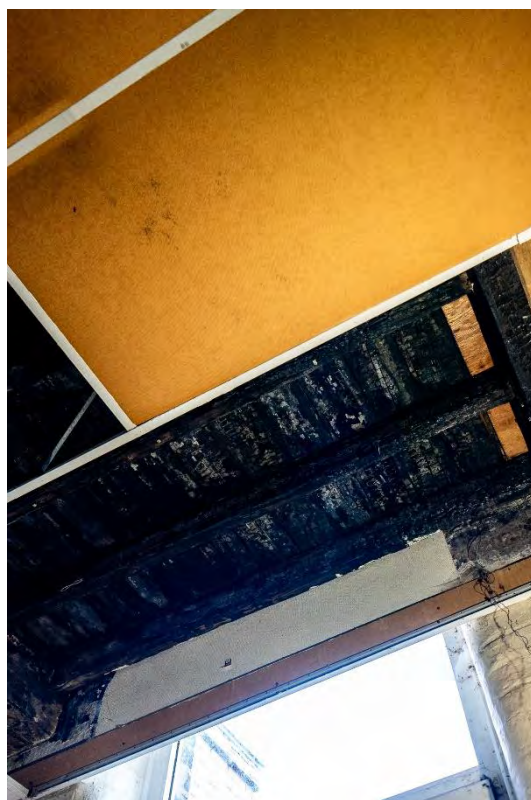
Fire-damaged ceiling at the eastern end of the third floor, facing north
